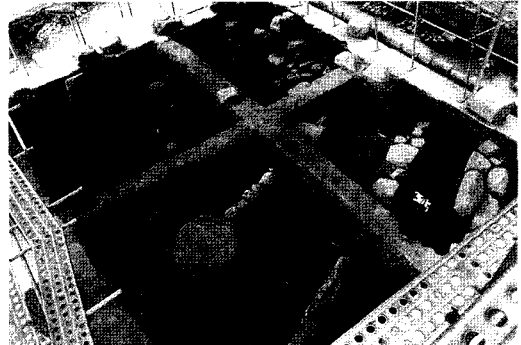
A view of excavation site at the Daewoongjeon Hall.
